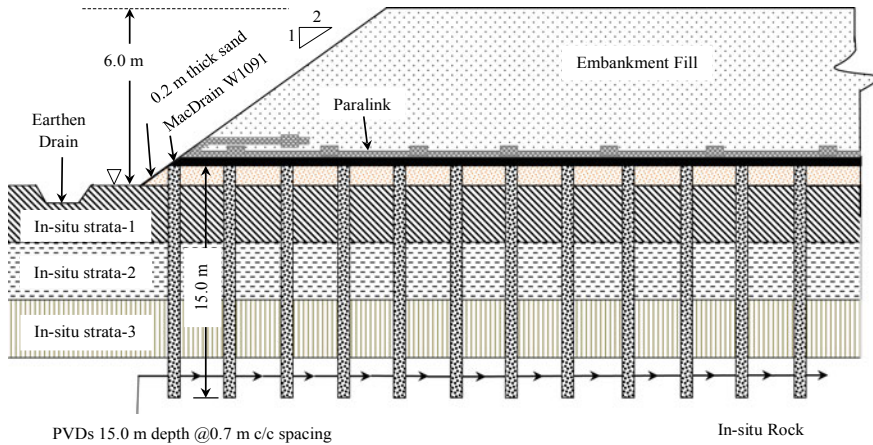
Typical cross section (a portion of the total embankment width of 106 m) of railway track (Ch-03 + 900 to Ch-04 + 400 km)
